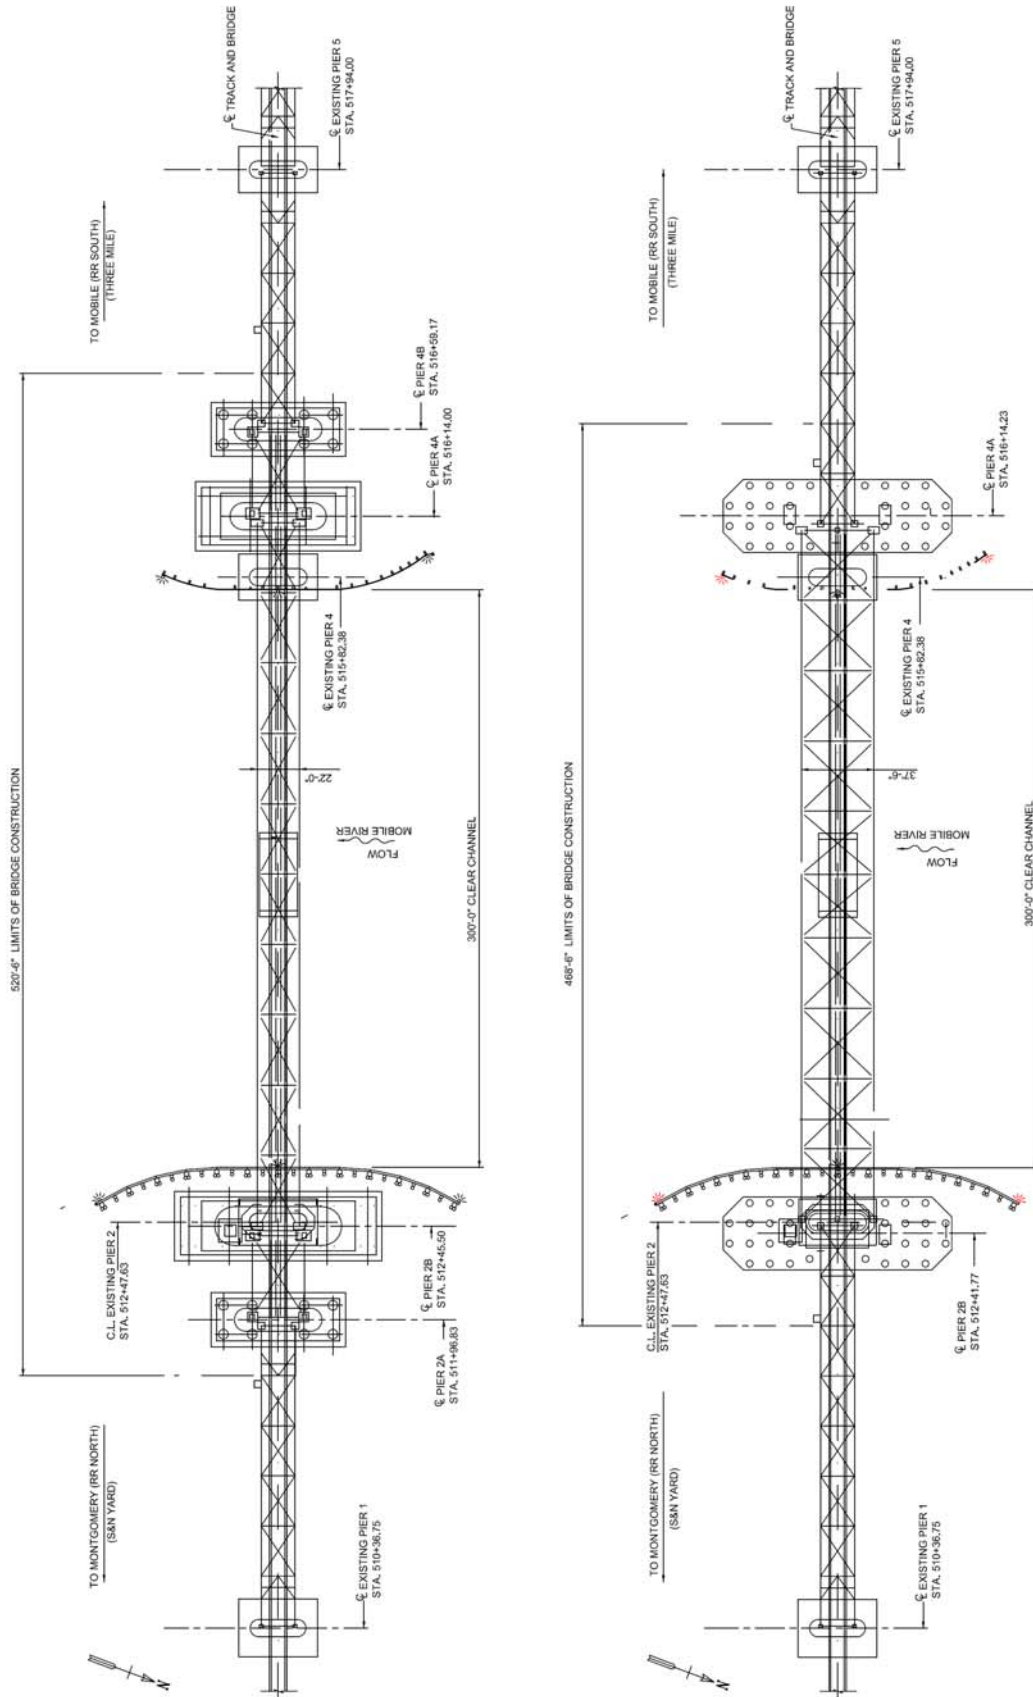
Plan view of original design layout (Top) and final design layout (Bottom).
